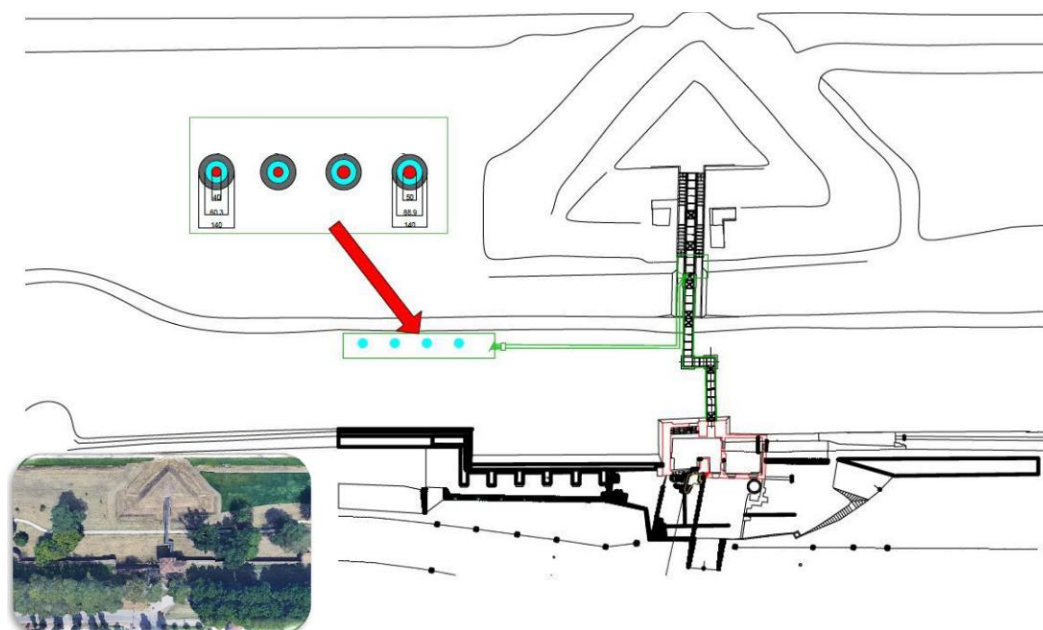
Porta Degli Angeli project layout showing the location of the ground heat exchangers and location of the plant room below the board walk.
